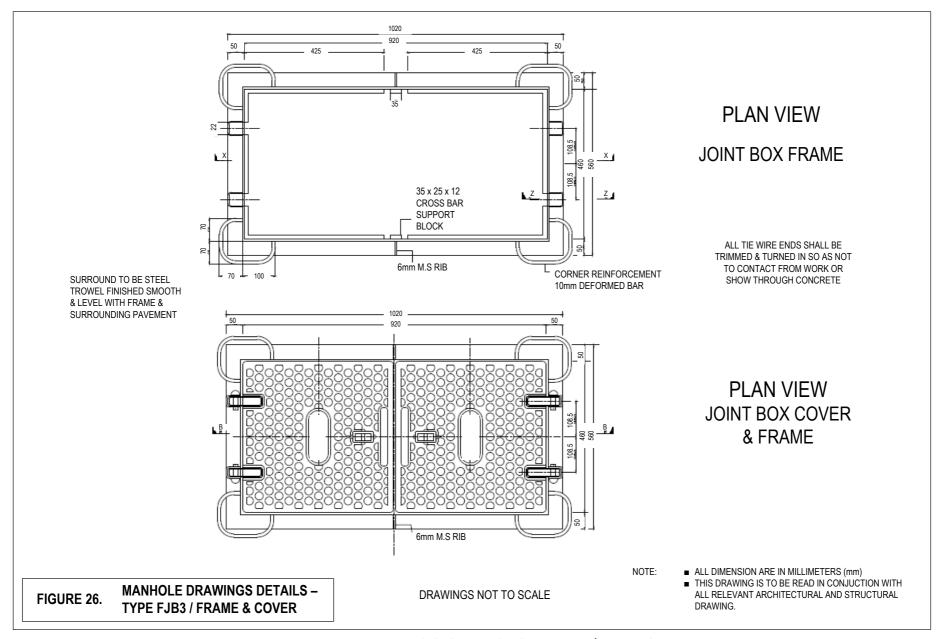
Manhole drawings details – Type FJB3 / Frame and cover
